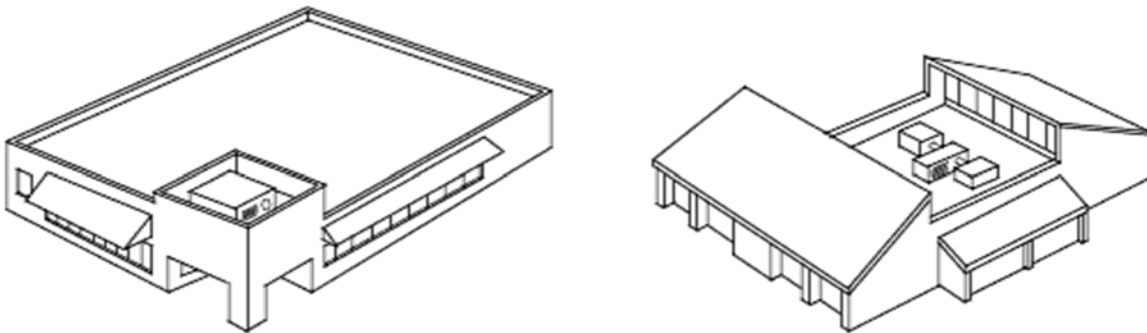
B.1: Examples of how to screen roof-mounted mechanical equipment.
